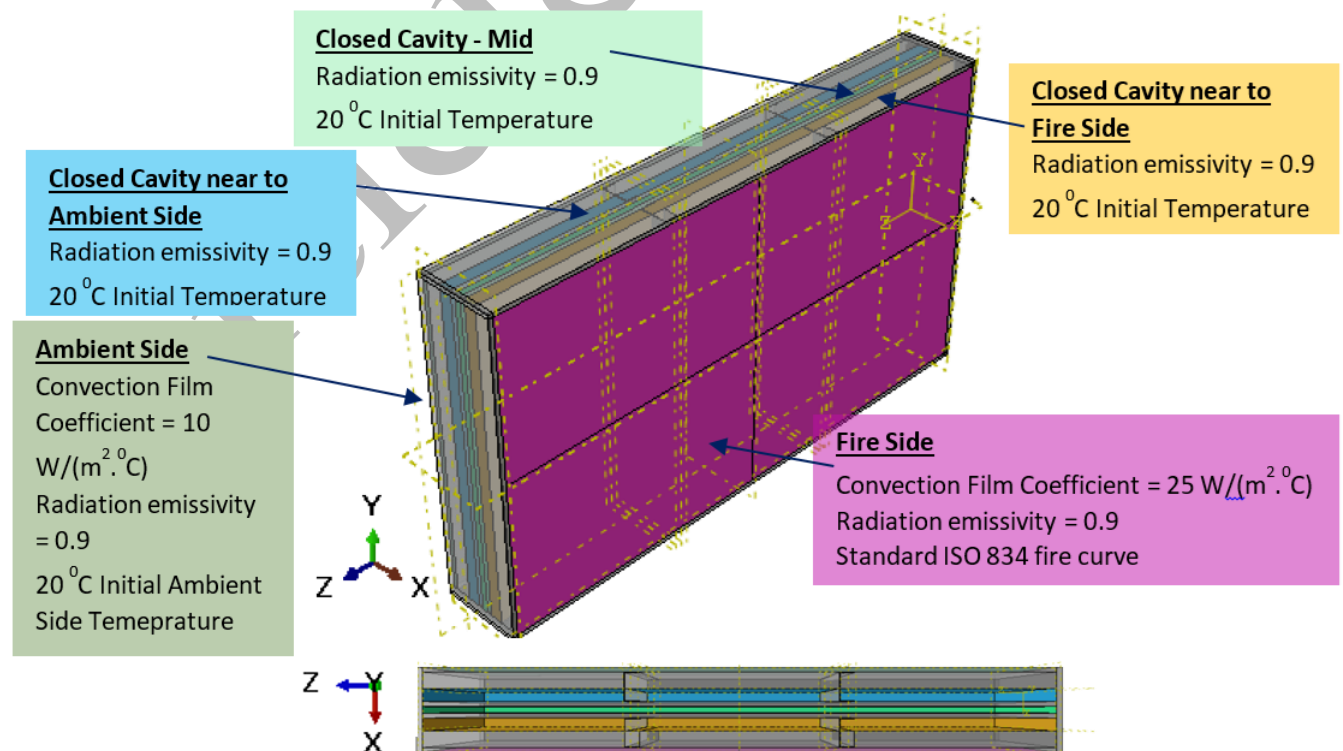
3D FEM developed for 15 mm thick single plasterboard modular LSF wall panel specimen with rock-wool insulation
